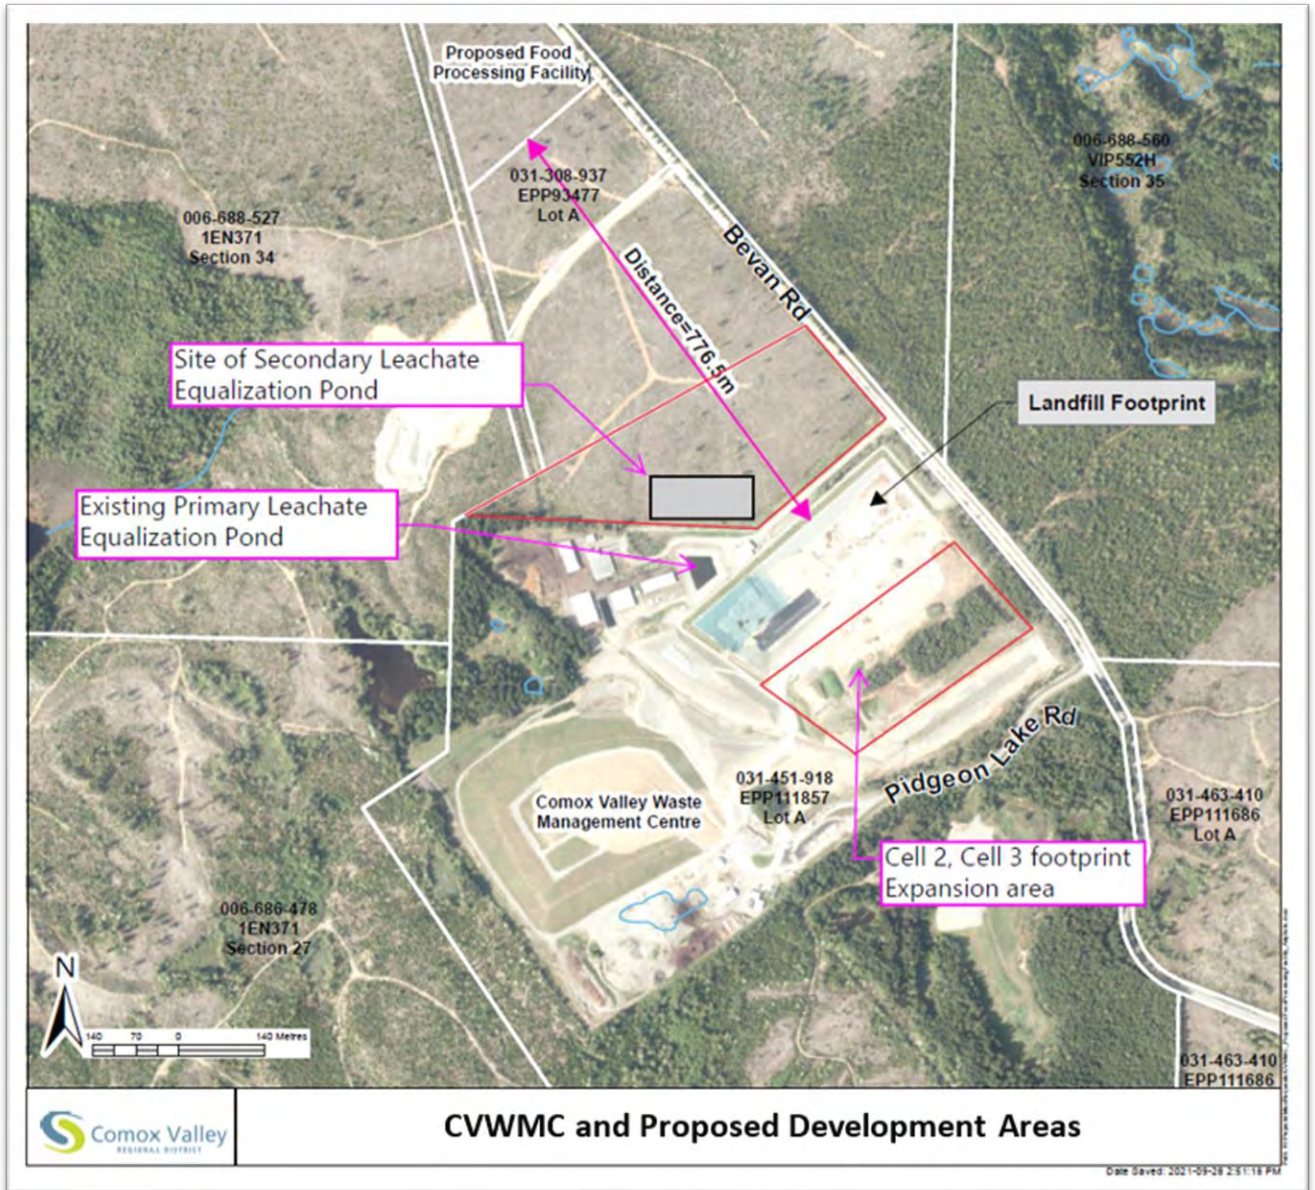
CVRD site plan for 3699 Bevan Rd, showing areas of interested outlined in red and locations of Cell 2, Cell 3 footprint expansion area and site of proposed secondary leachate pond.
